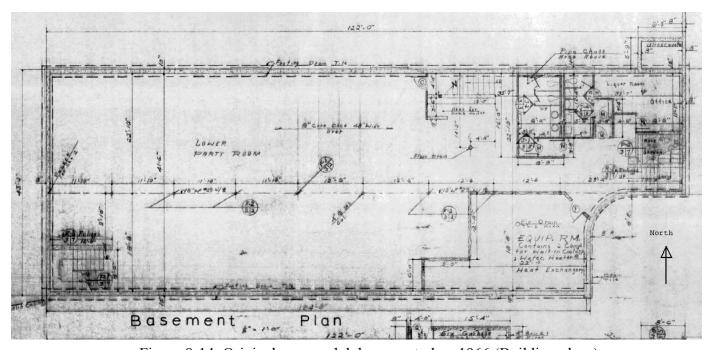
Original supper club basement plan, 1966 (Building plans)
